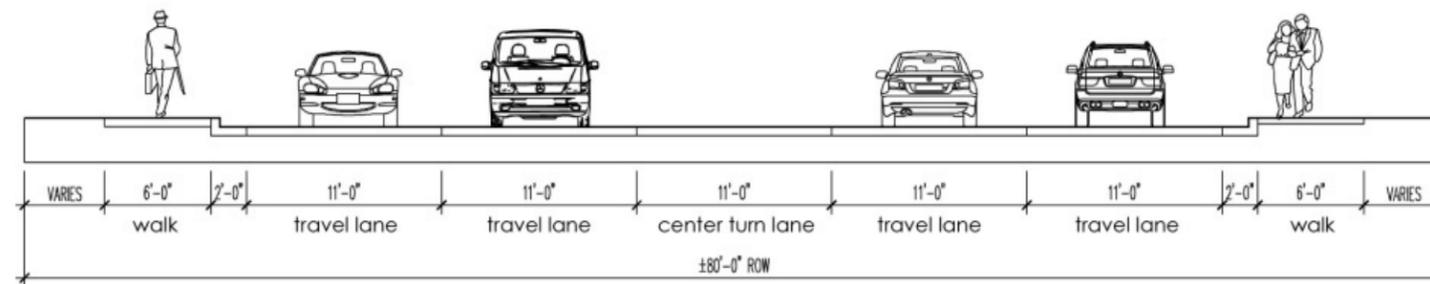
SR 483/Clyde Morris Boulevard Typical Cross Section (North of US 92/SR 600)
